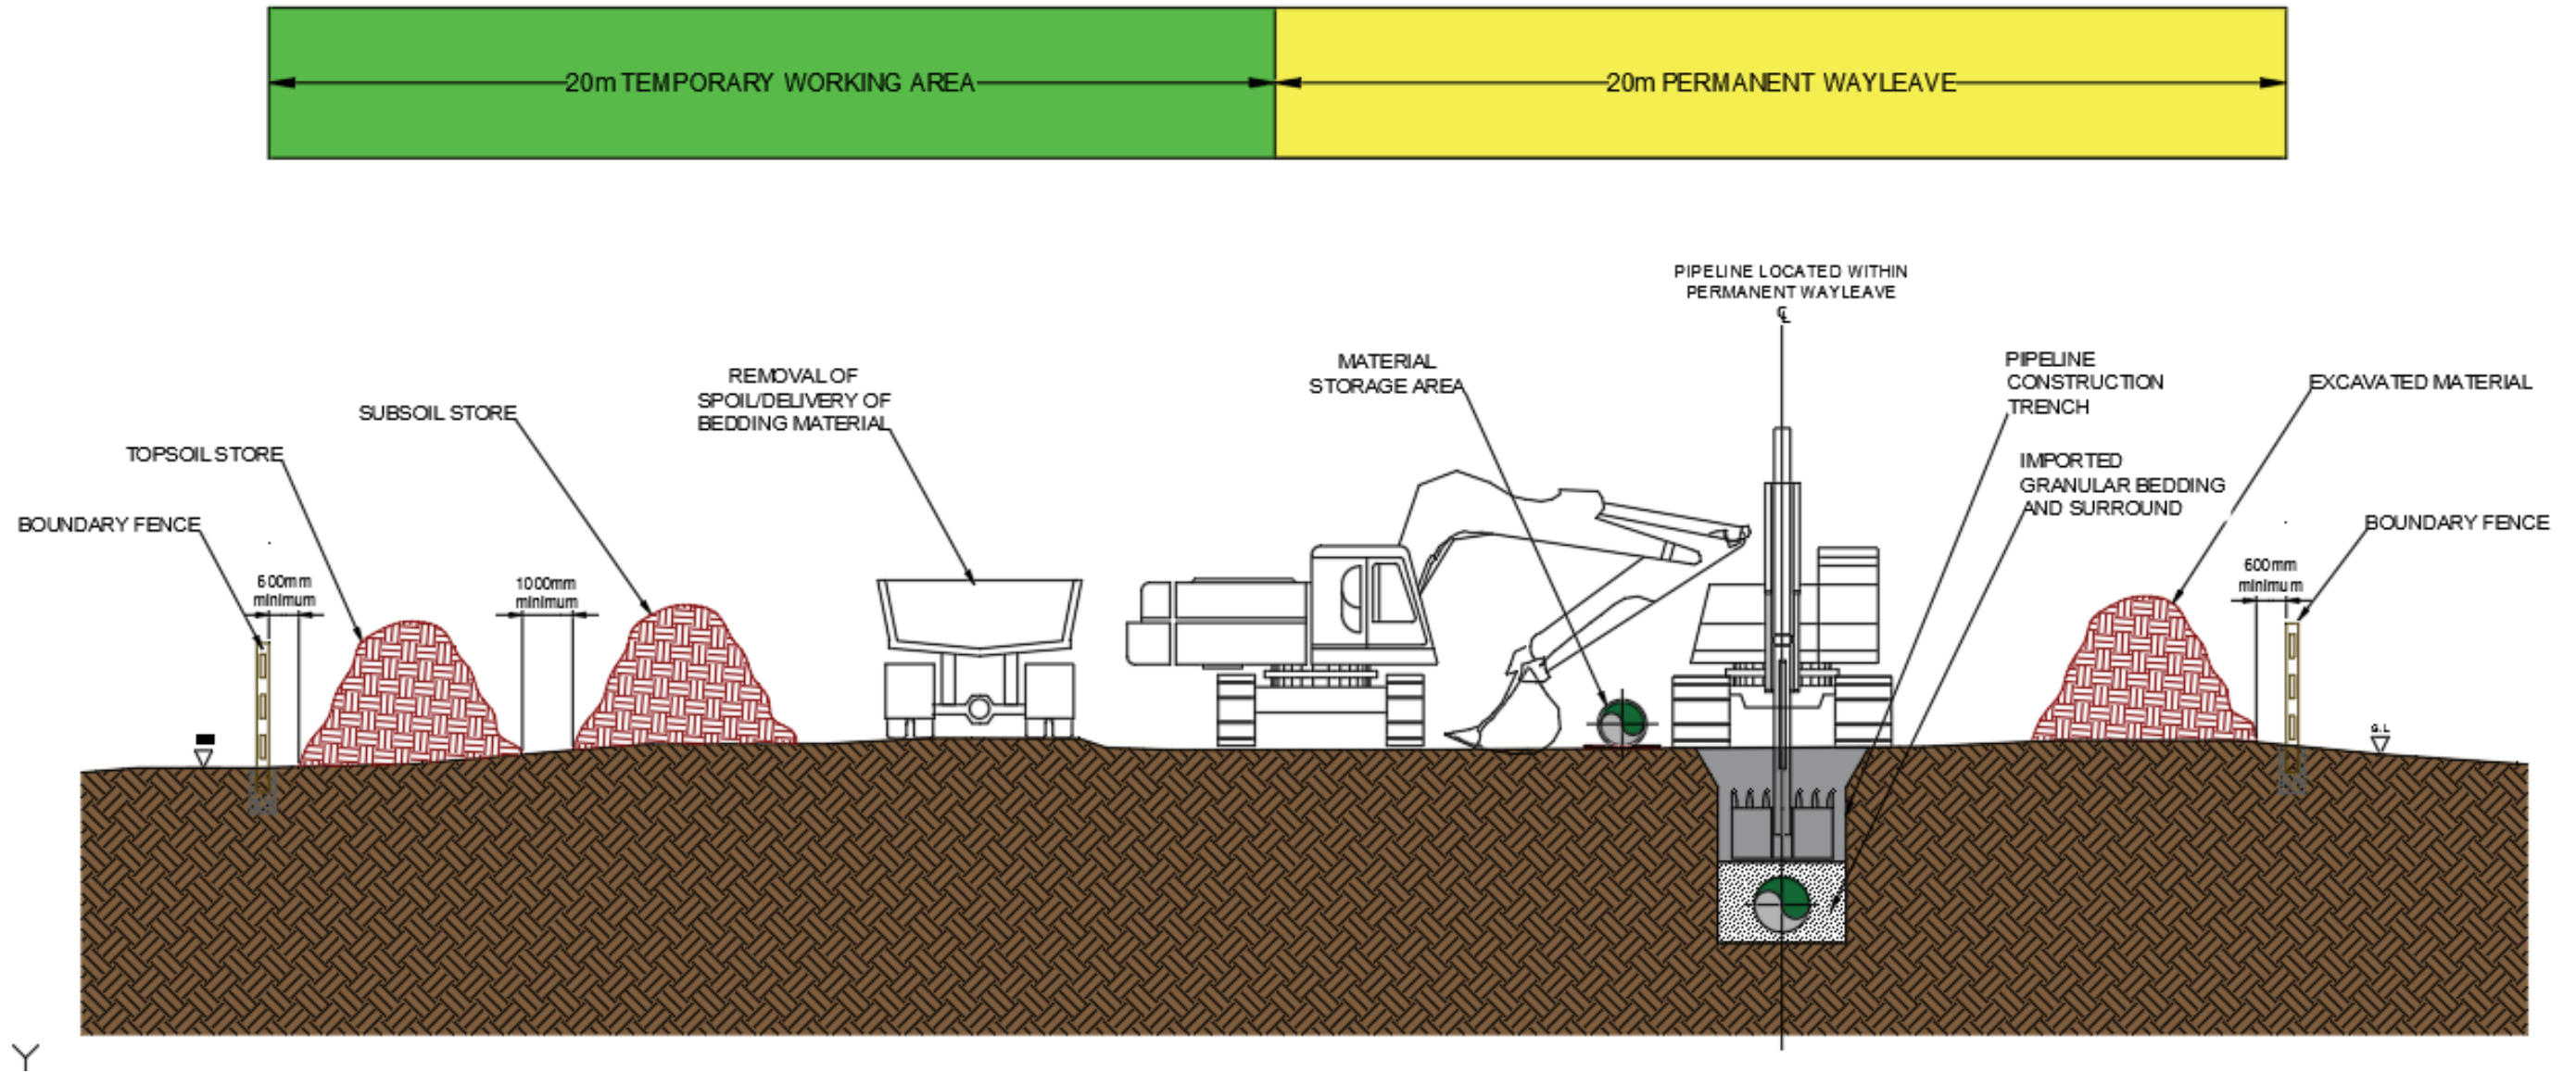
Typical Proposed Construction Corridor (40m) and 20m Wayleave Schematic
